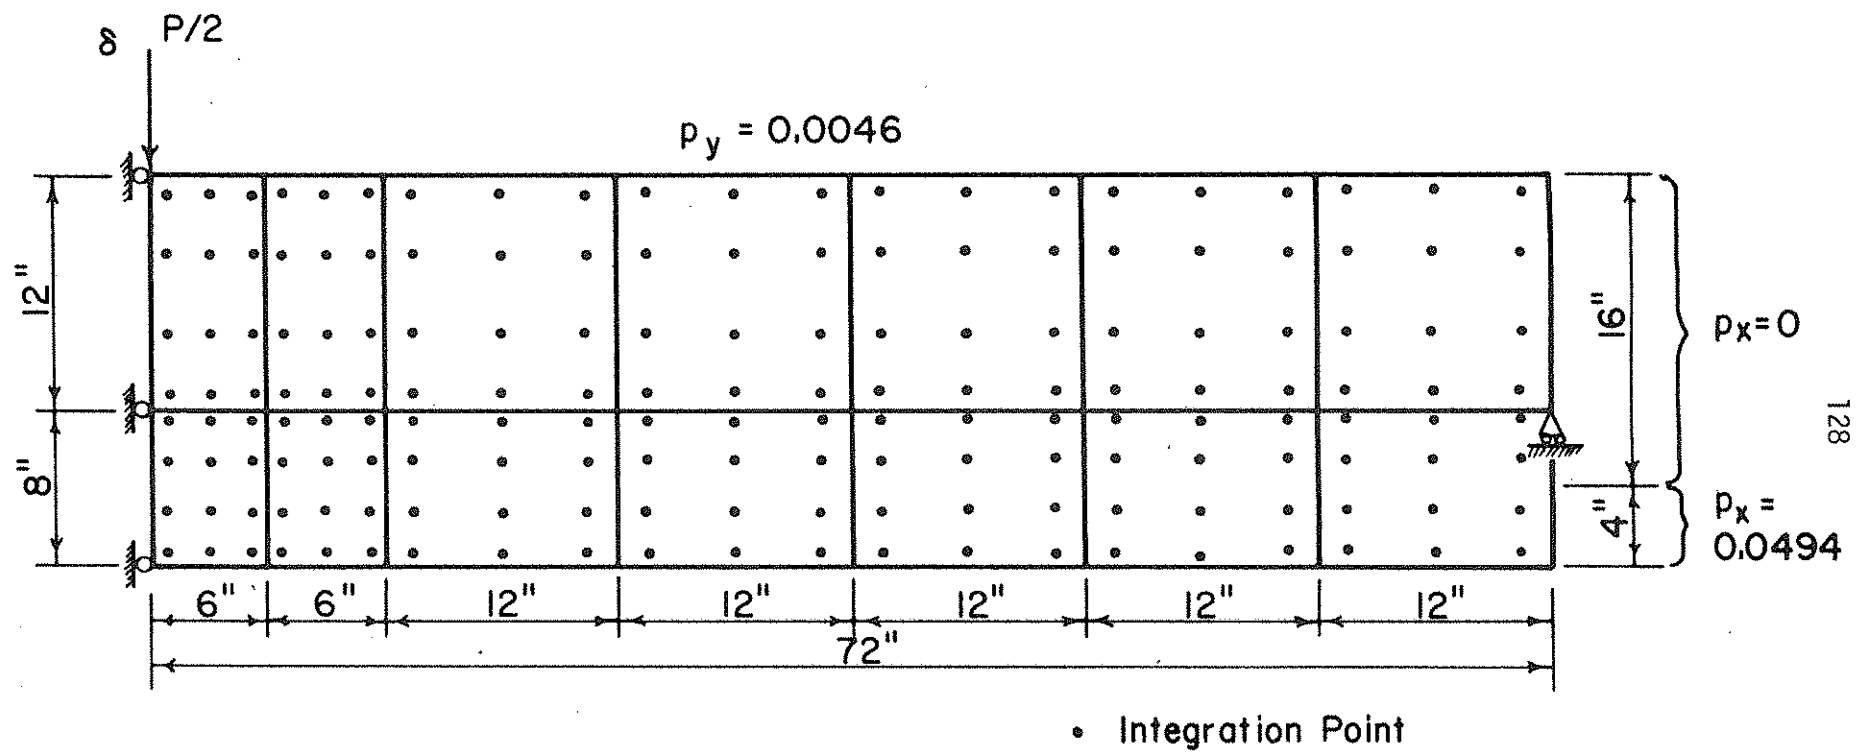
Finite Element Model of Beam Test Specimen J-4
